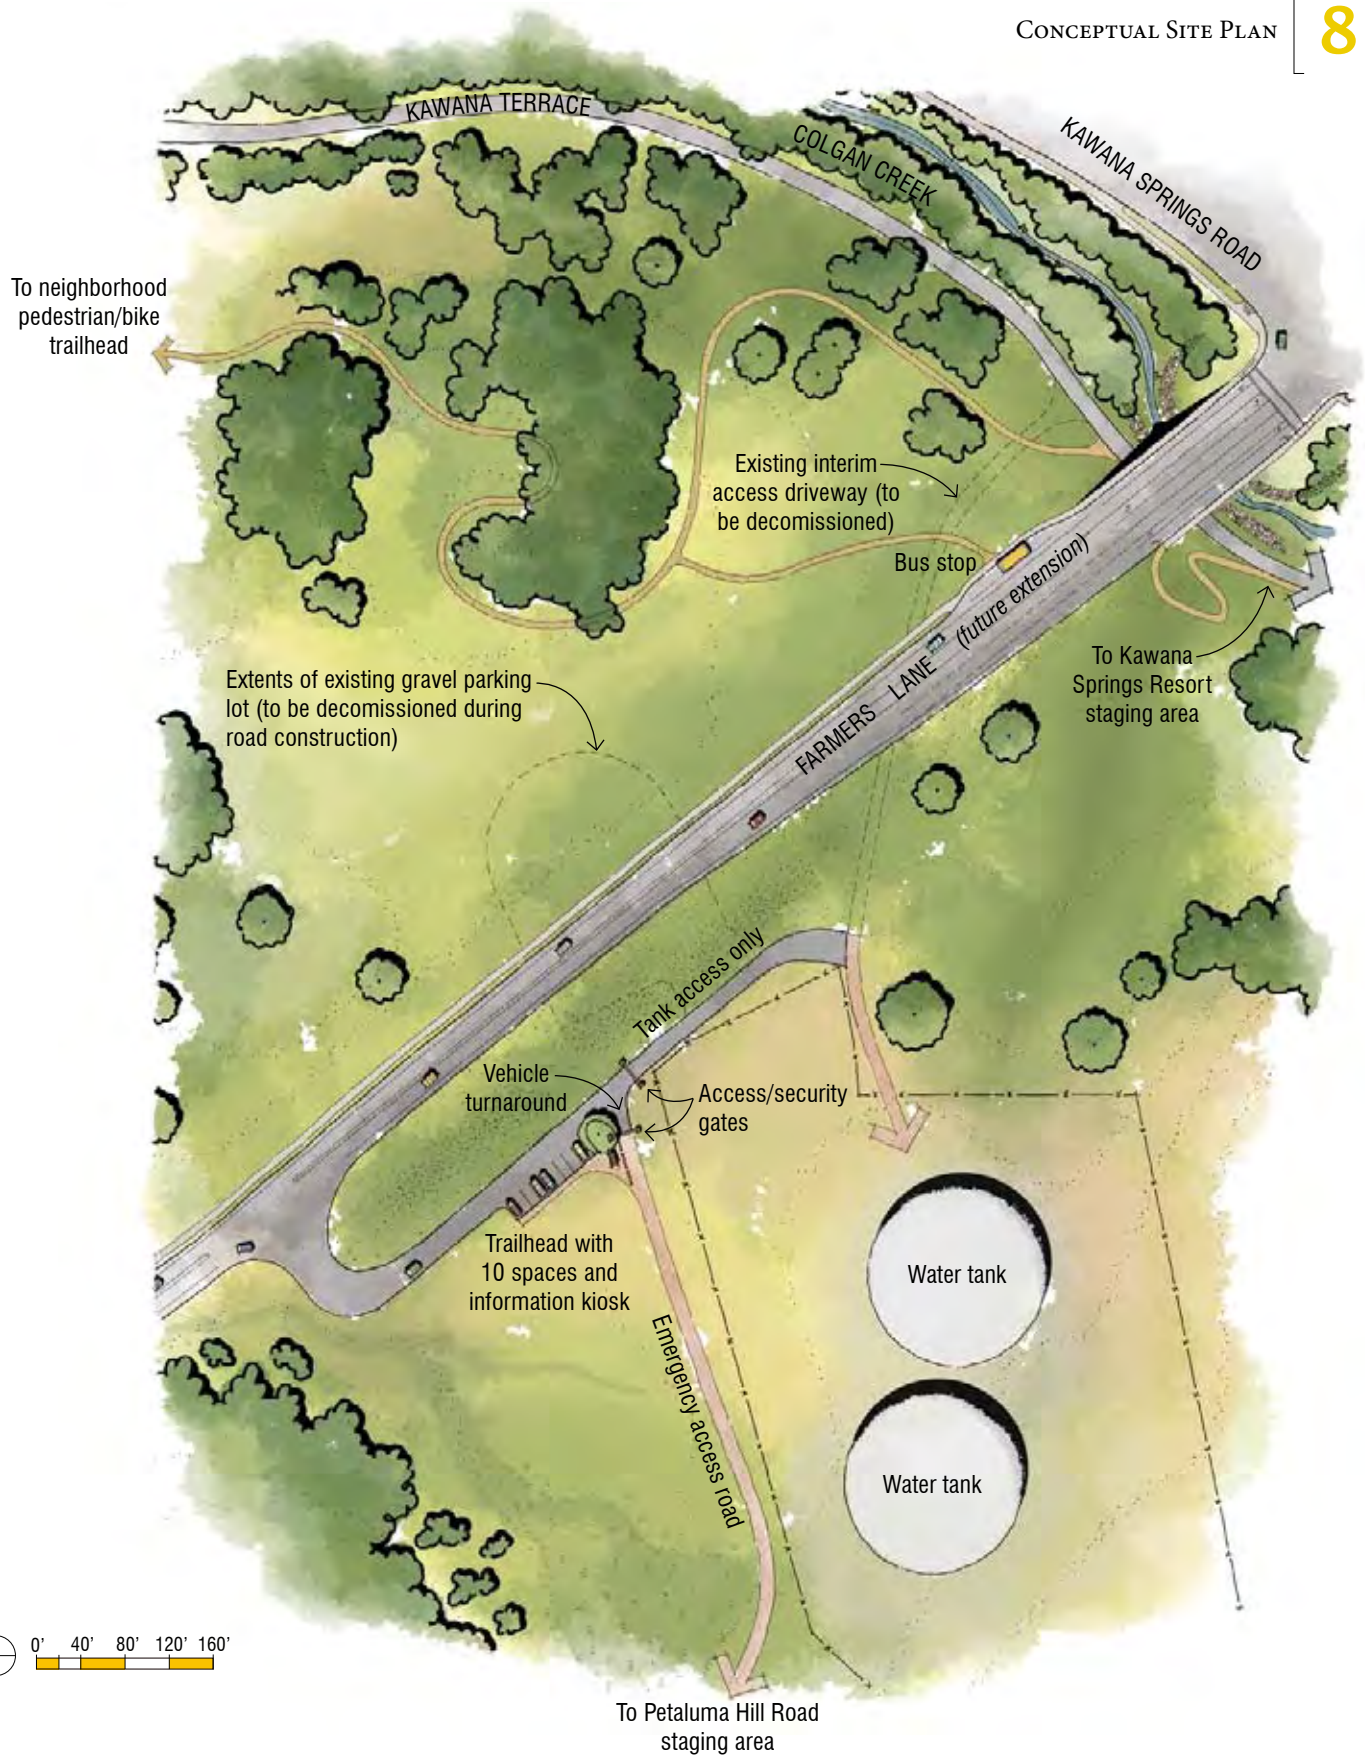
Farmers Lane Staging Area and Kawana Knoll Area Site Plan.
